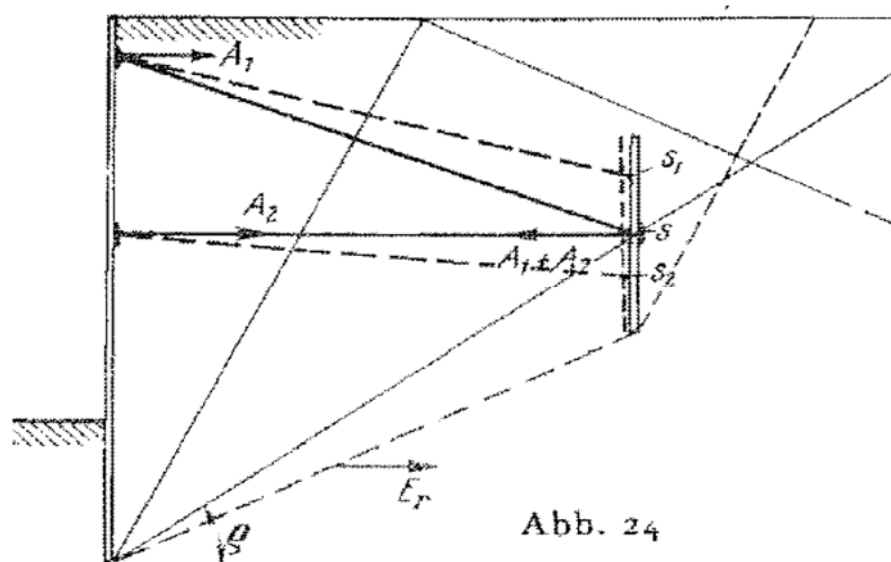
Example for a multiple anchored sheet pile wall in one anchor wall [1]
